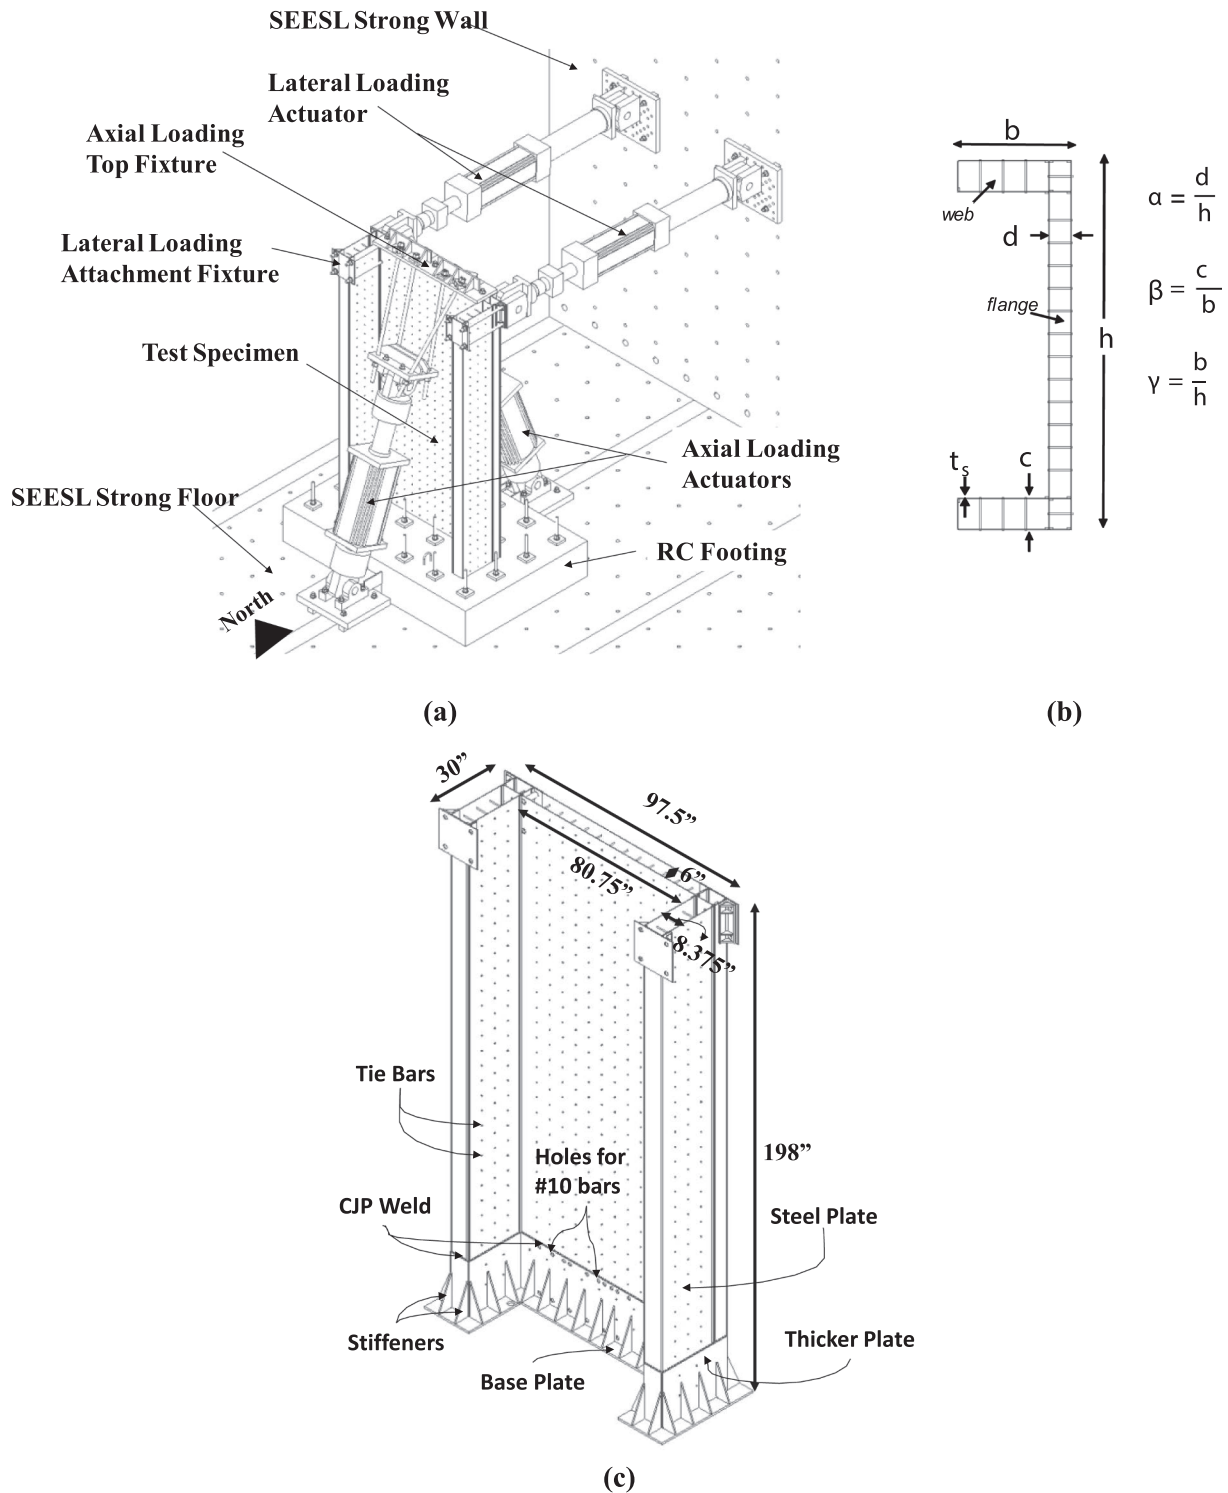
(a) Test setup of C-Shaped Composite Plate Shear Wall/Concrete Filled (C-SPW/CF), (b) cross-section of the walls, and; (c) isolated wall (Note: 1 in. = 25.4 mm).
